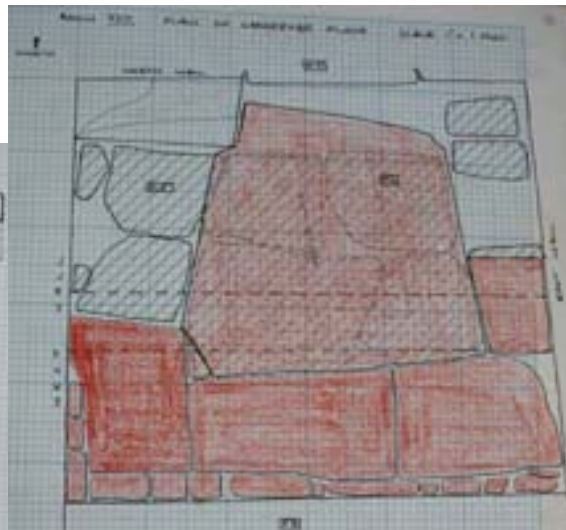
Plan of Garderobe, showing paved floor (red=replaced floor, hatched=original floor) and location of stone arch.
